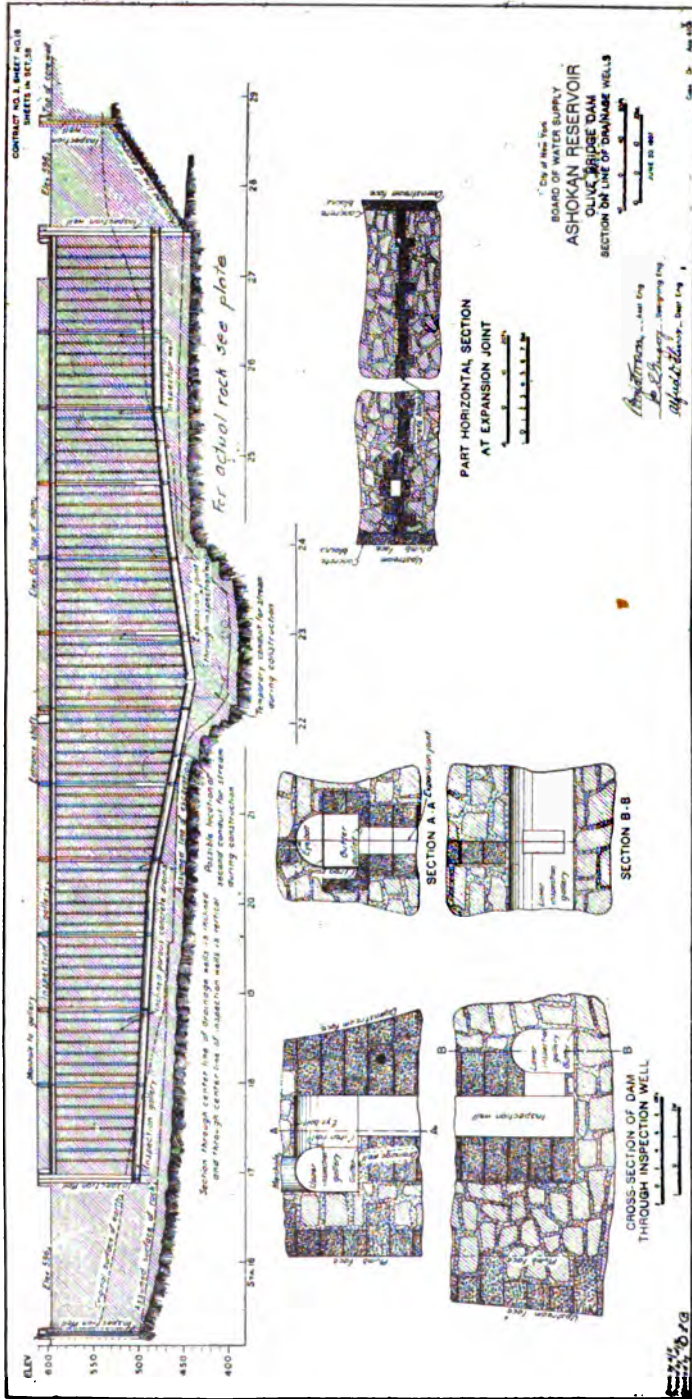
Olive Bridge Dam. Contract Sections of Dam on Line of Drainage Wells. Inspection Galleries and Wells and Expansion Joint.
